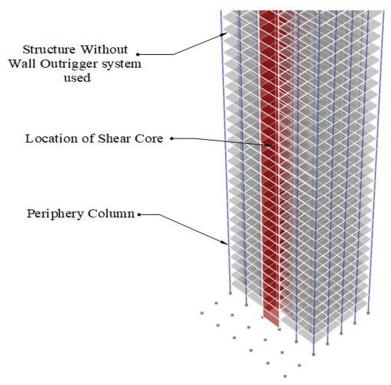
Without wall outrigger - 3D cutout view of the tall structure
